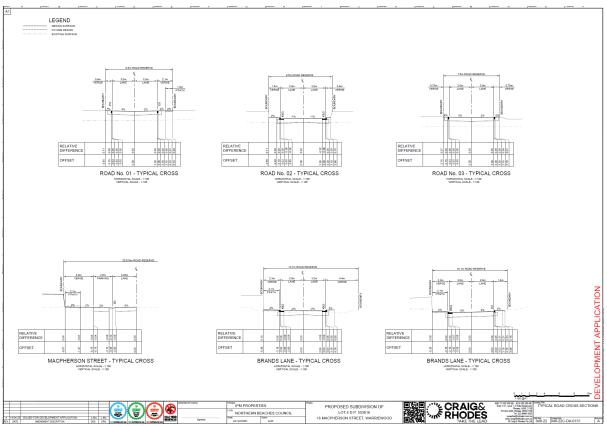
Typical road cross section plan (Source: Craig & Rhodes)
